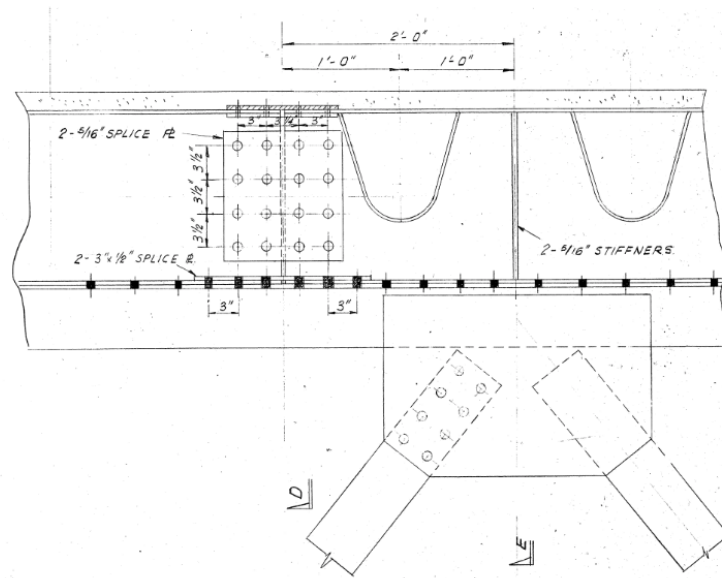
Floor beam connected to top chord of truss (courtesy of B&T).
